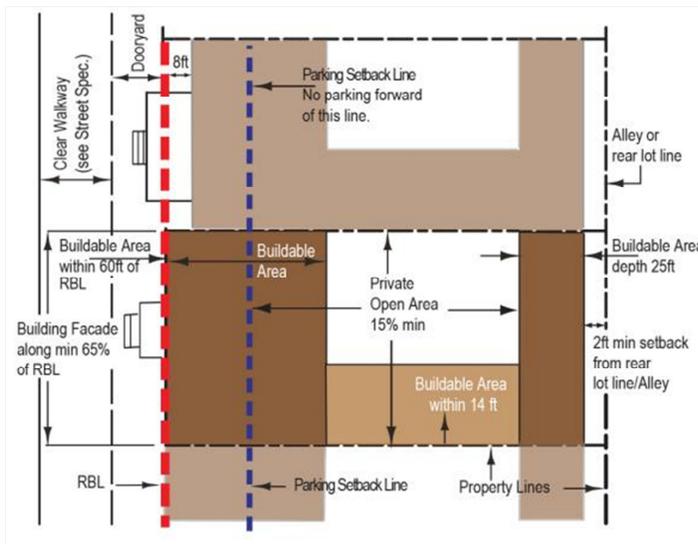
Townhouse/Small Apartment Siting Standards
